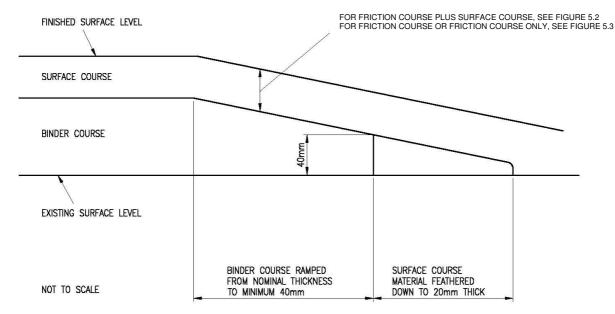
Ramps between New Surfacing and Existing Pavements
